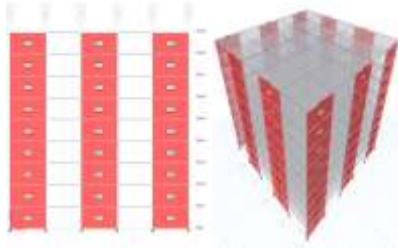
Edge Shear wall (3 bays ) + Coremodel
